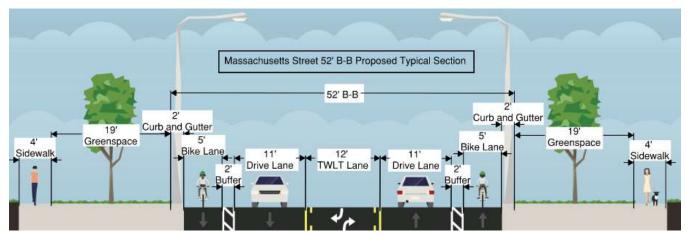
Proposed Typical Section - 4-Lane to 3-Lane Roadway Reconfiguration
